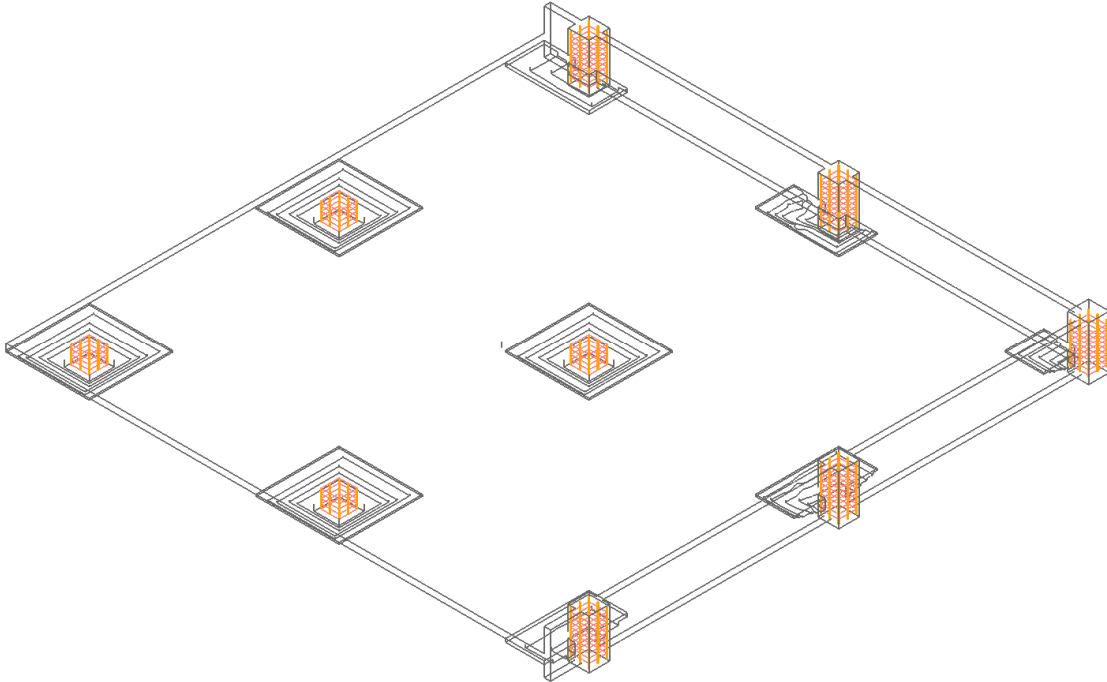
Isometric view of the support rebar provided at each support location. Note: an outline of the concrete model is shown in grey. Elastic columns are not shown.
